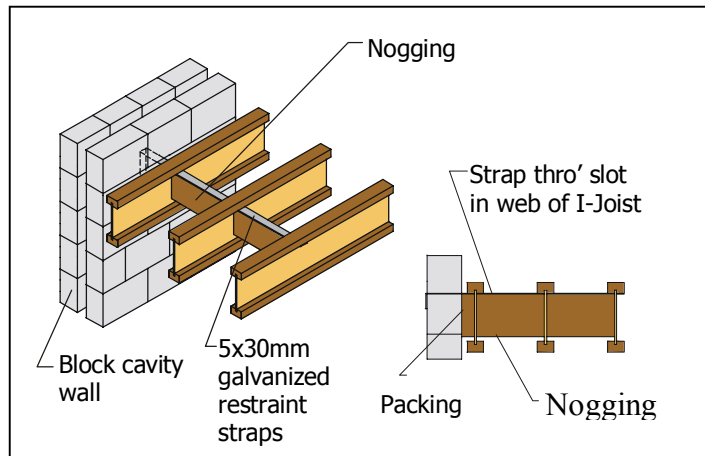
Wall Restraint Strap Detail for I-Joist Floors.
